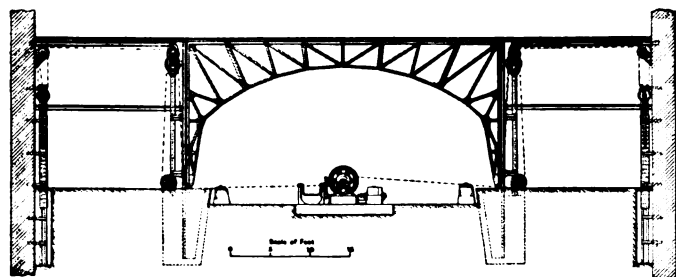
PLAN OF ELECTRICAL OPERATION, DRURY LANE STAGE.
